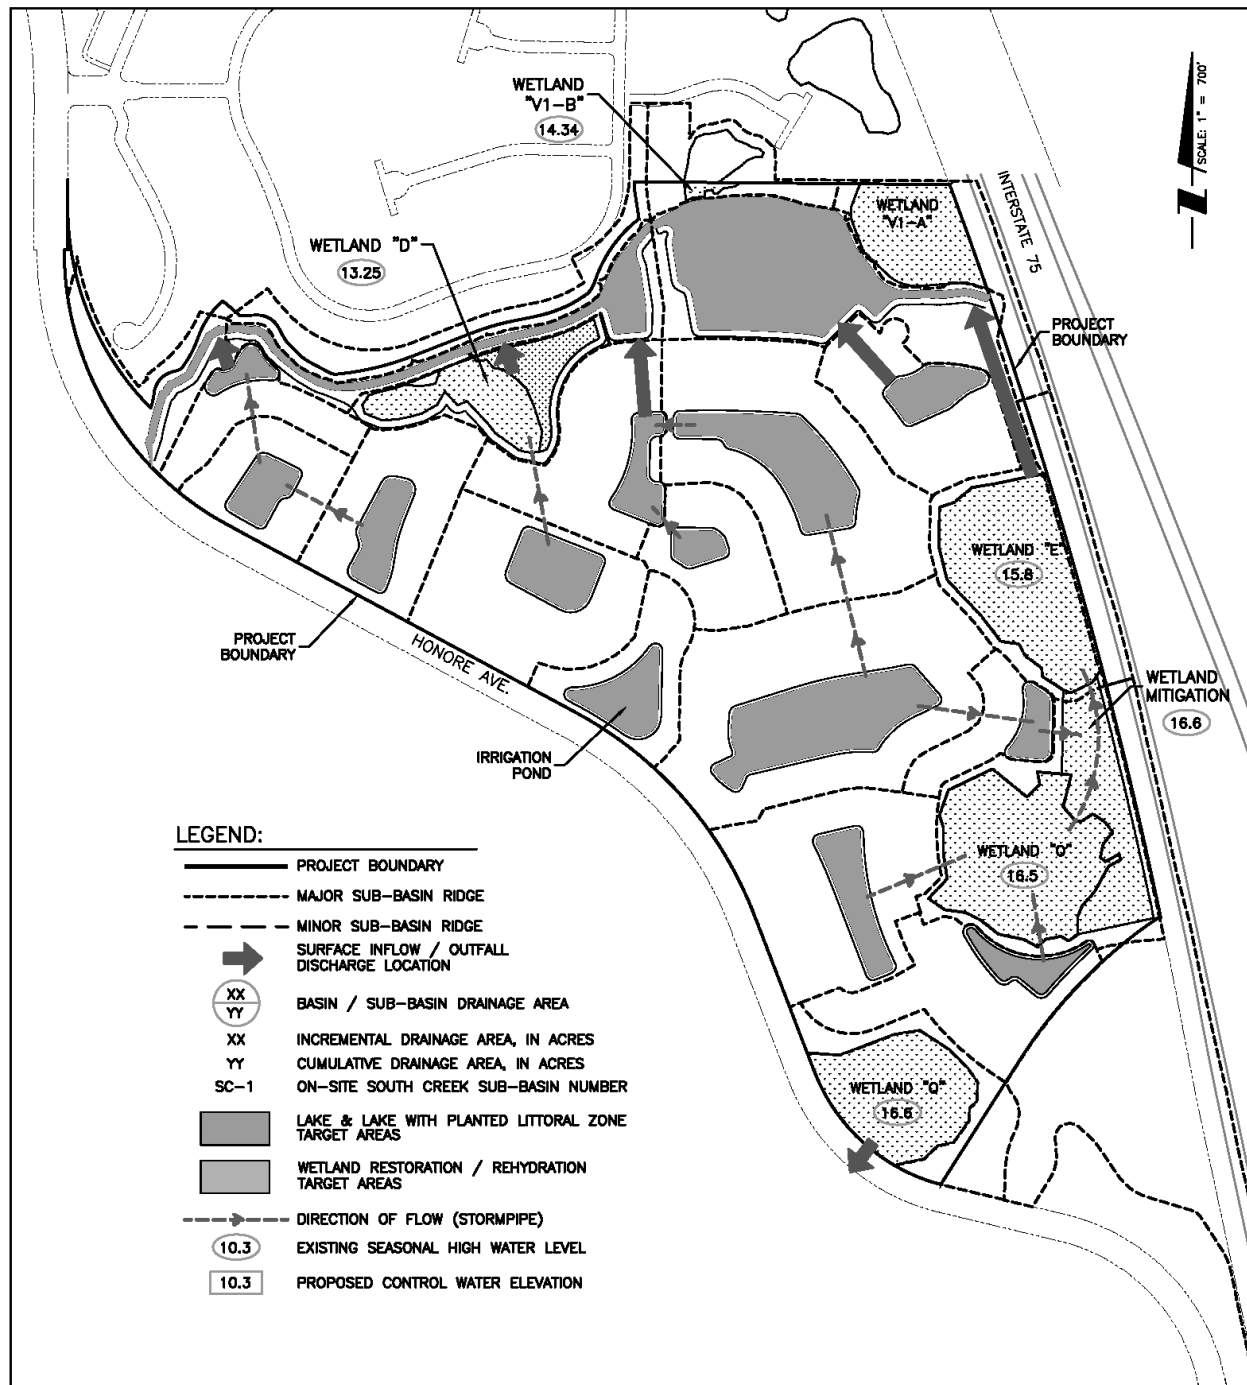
EXHIBIT E – Conceptual On-Site Surface Water Management Plan
